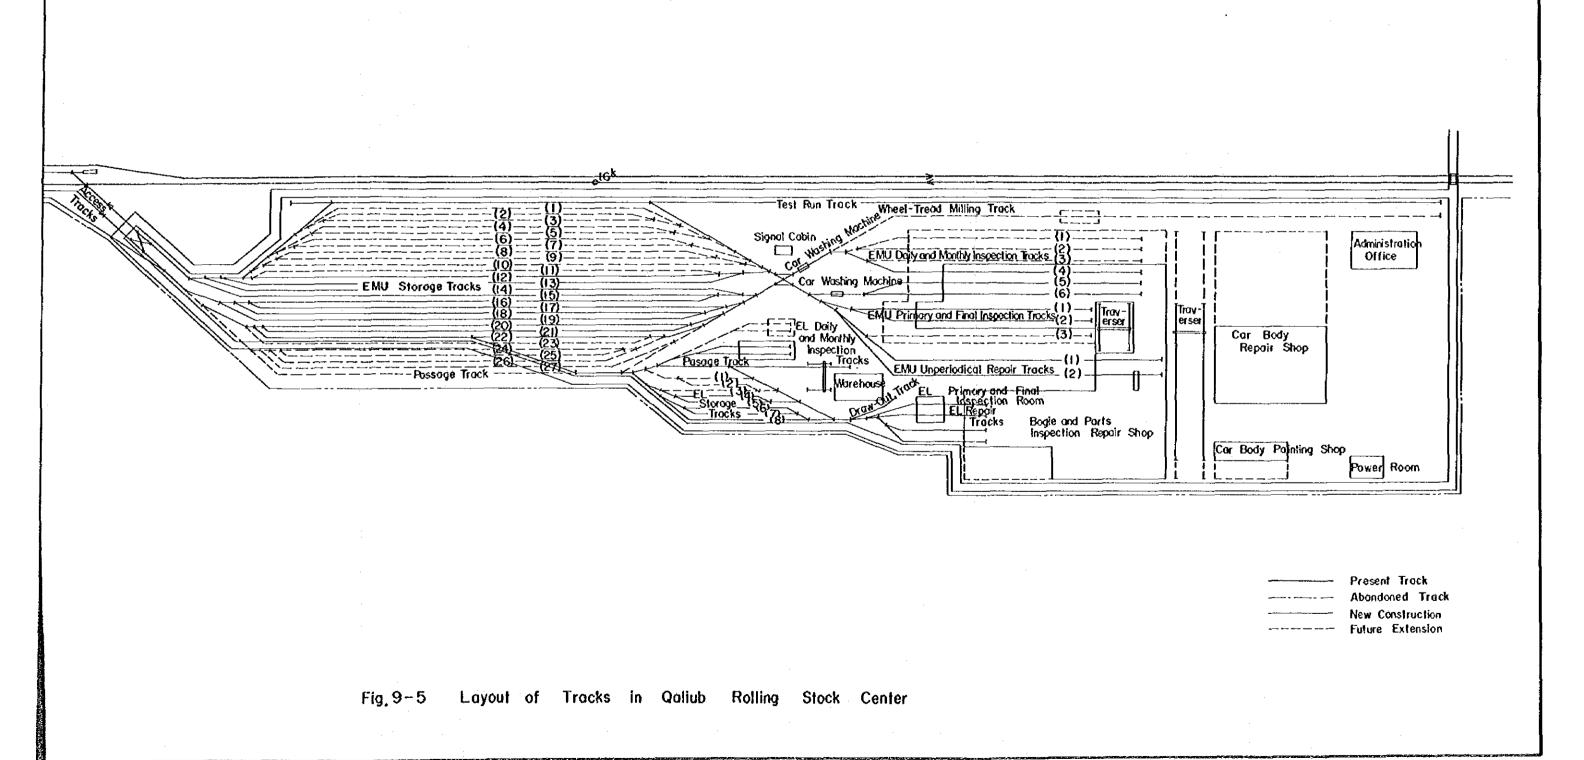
Layout of Tracks in Qaliub Rolling Stock Center
